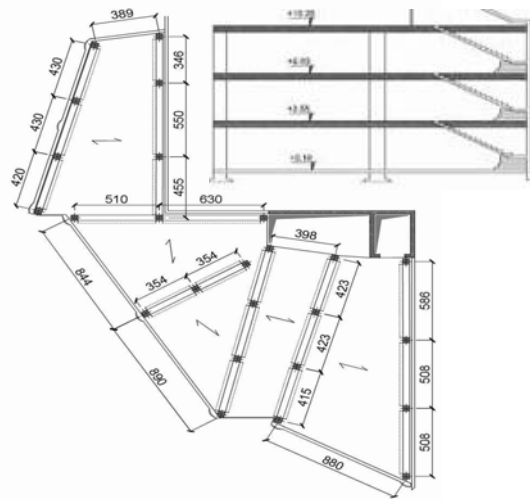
Plan view and elevation of the first application of the cable-stayed solution
